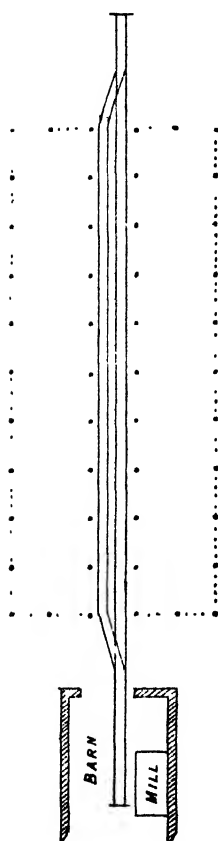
Plan of sheaf-sheds connected by rails with barn.
